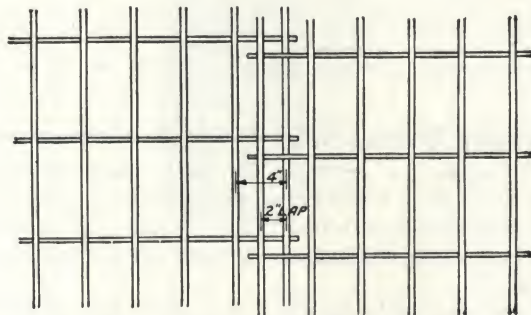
Electrically Welded Fabric As It Actually Appears with a Side Lap of 2 in.
